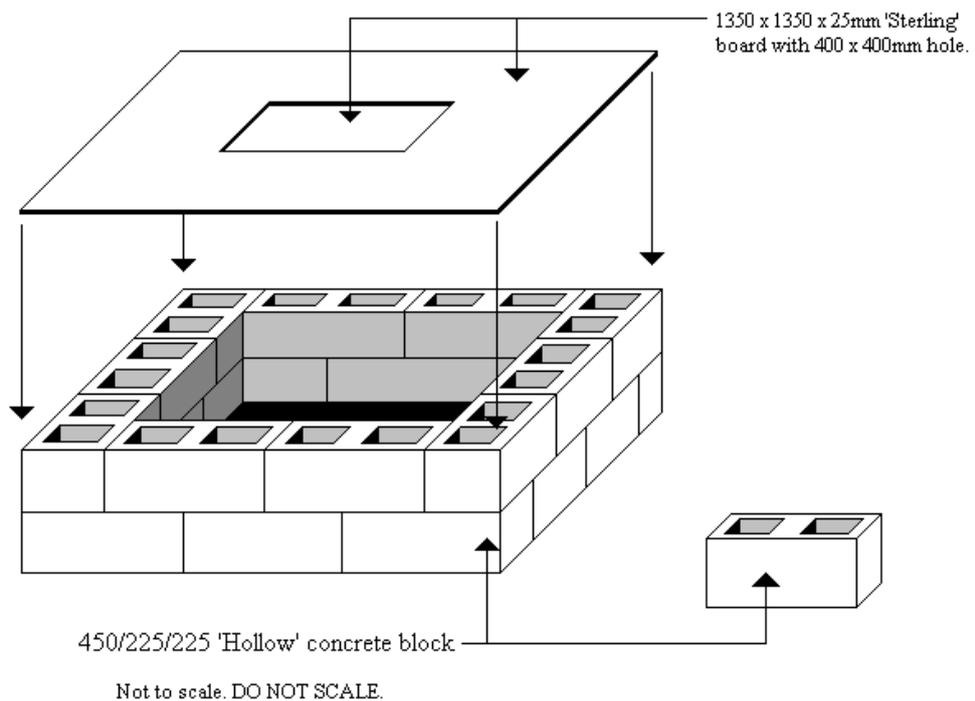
BASE. The floor/ground need to be flat and level. Sterling board has been suggested as it has a 'rough' surface, enabling lesser horseshoe bats to grip. In my original 'tower' I fixed nylon netting to the underside of the boarding.
